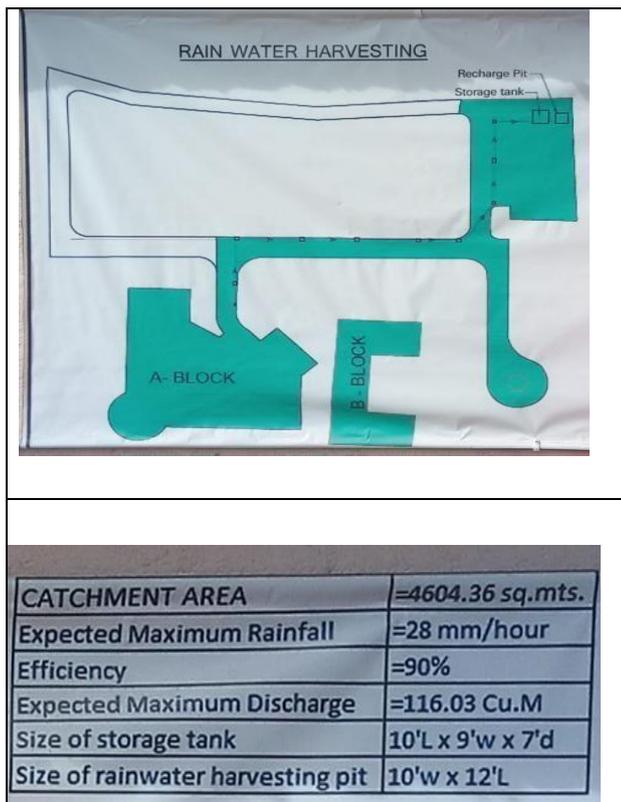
Rain Water Harvesting Structure at KG Reddy College of Engineering and Technology.
